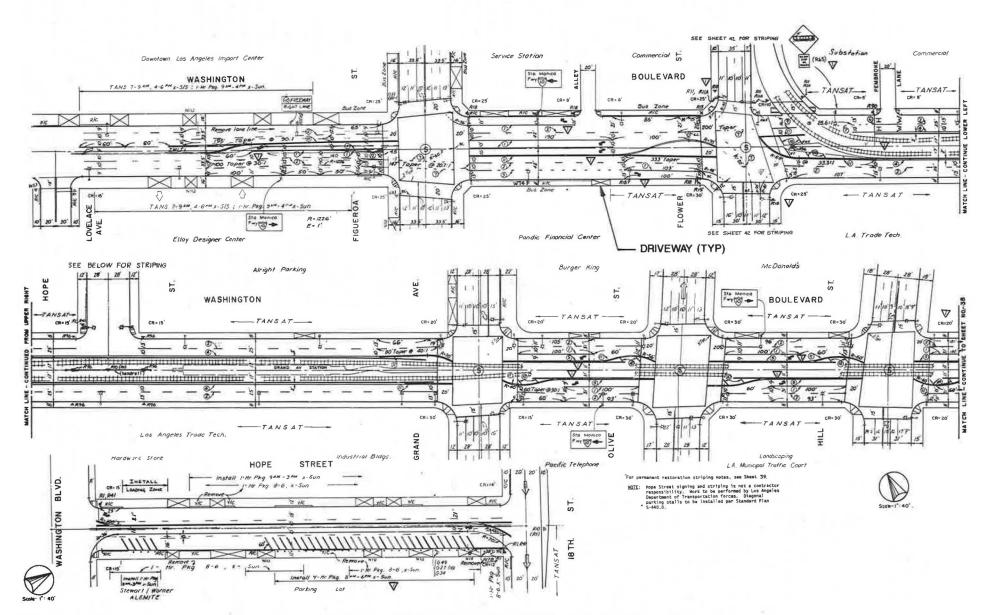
Roadway lane layout and trackway on the short blocks typical of the western portion of Washington Boulevard.
